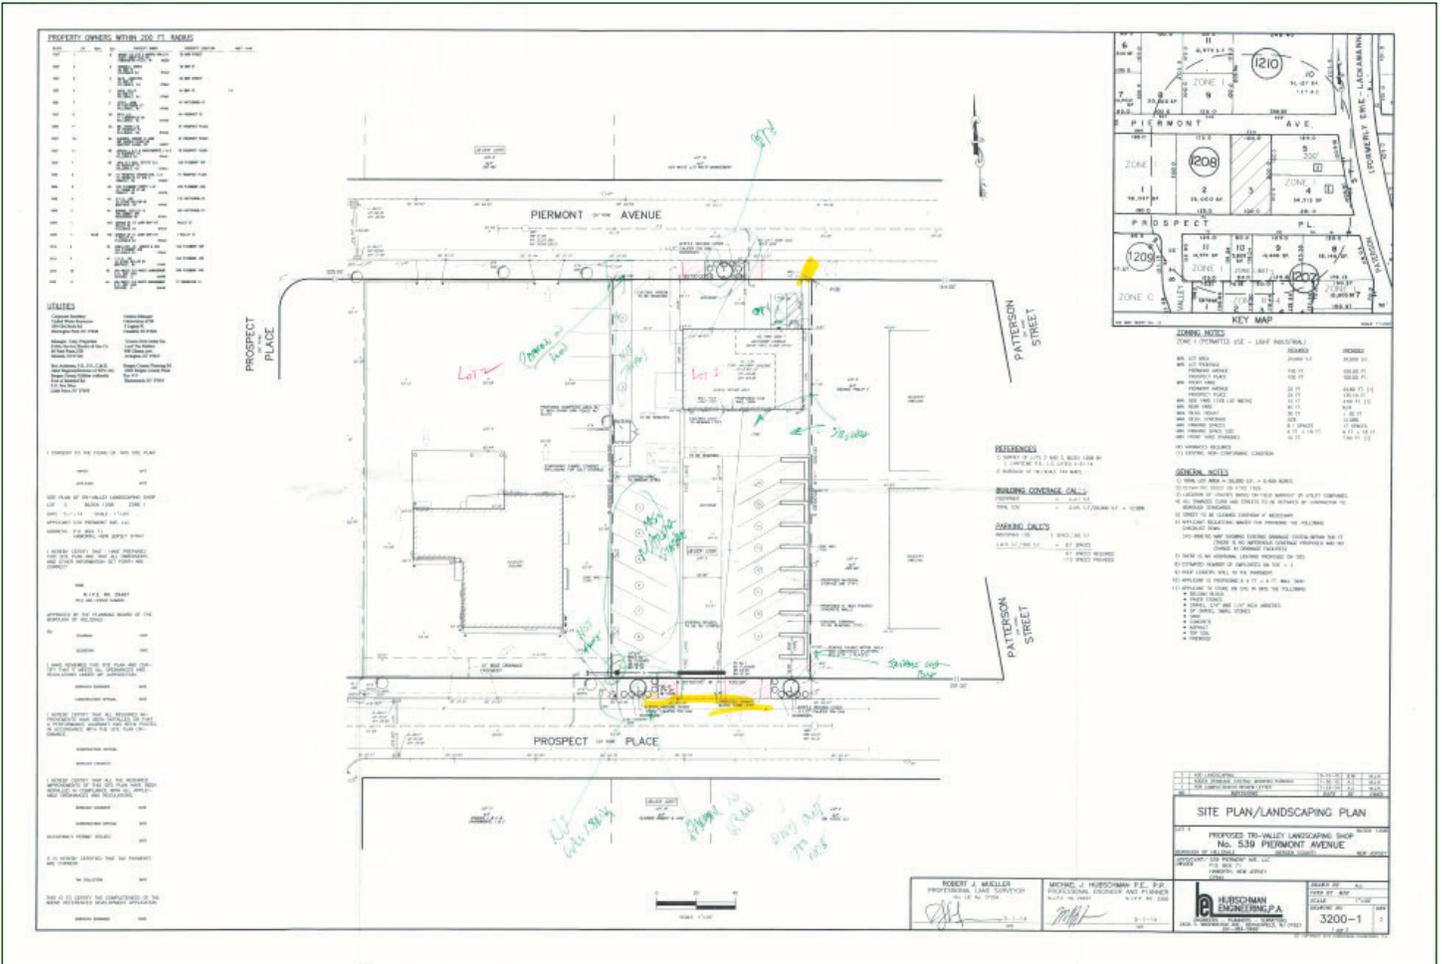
Building Department Site Plan depicting parking along the Prospect Place frontage and macadam along the Piermont Avenue frontage. No large concrete bins are identified or located on this site plan.
